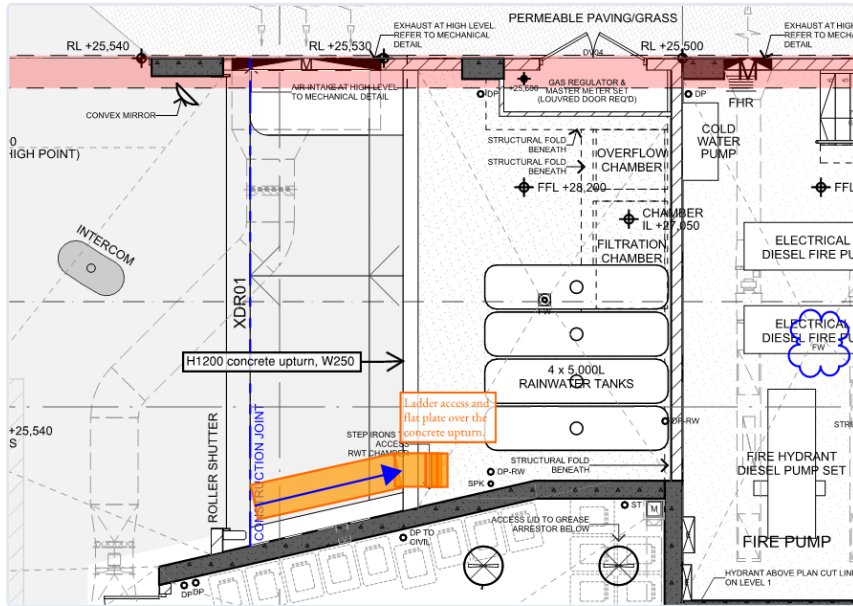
Architectural markup plan showing mezzanine location, rainwater tanks, concrete upturn wall, step irons, RWT access chamber, and driveway circulation area. Orange annotation indicates existing ladder access point and flat plate over concrete upturn.
